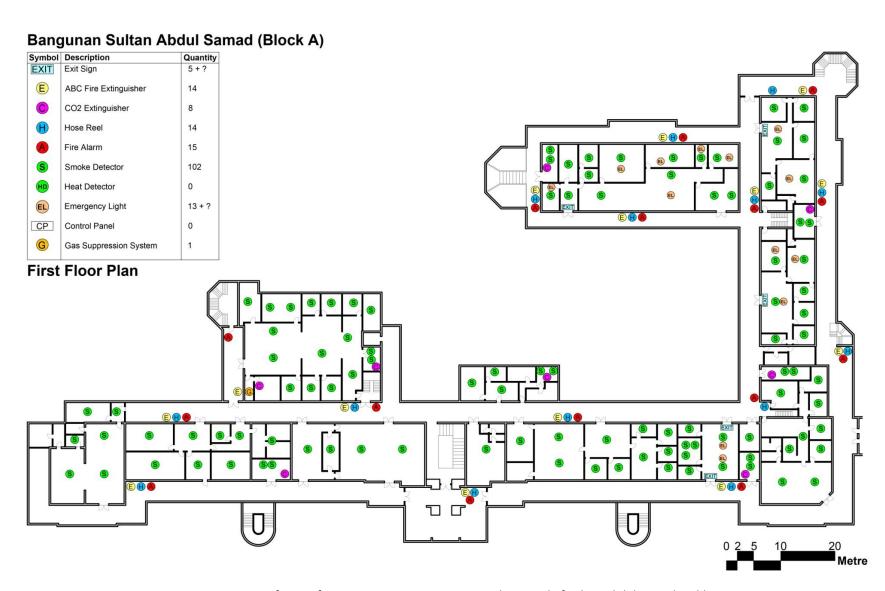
Location of active fire protection measures at First Floor Level of Sultan Abdul Samad Building.
